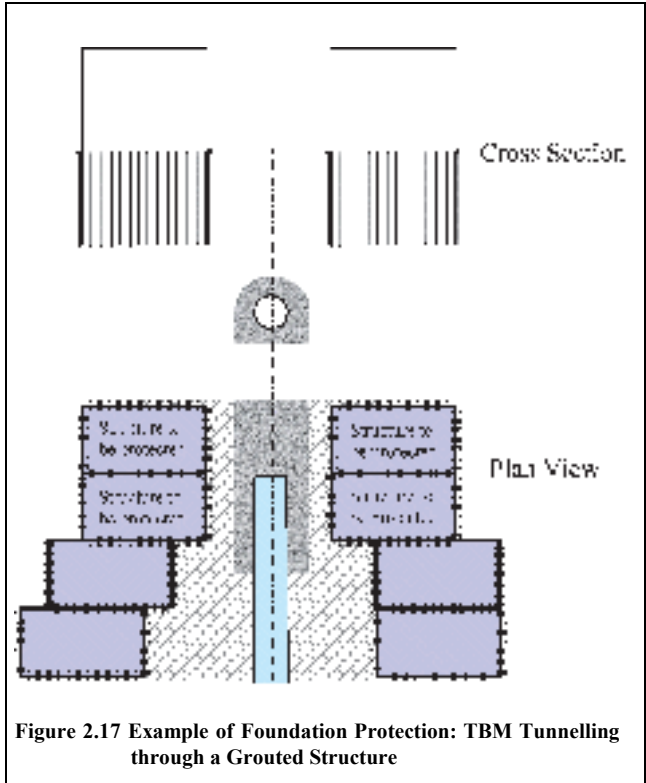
Example of Foundation Protection: TBM Tunnelling through a Grouted Structure
